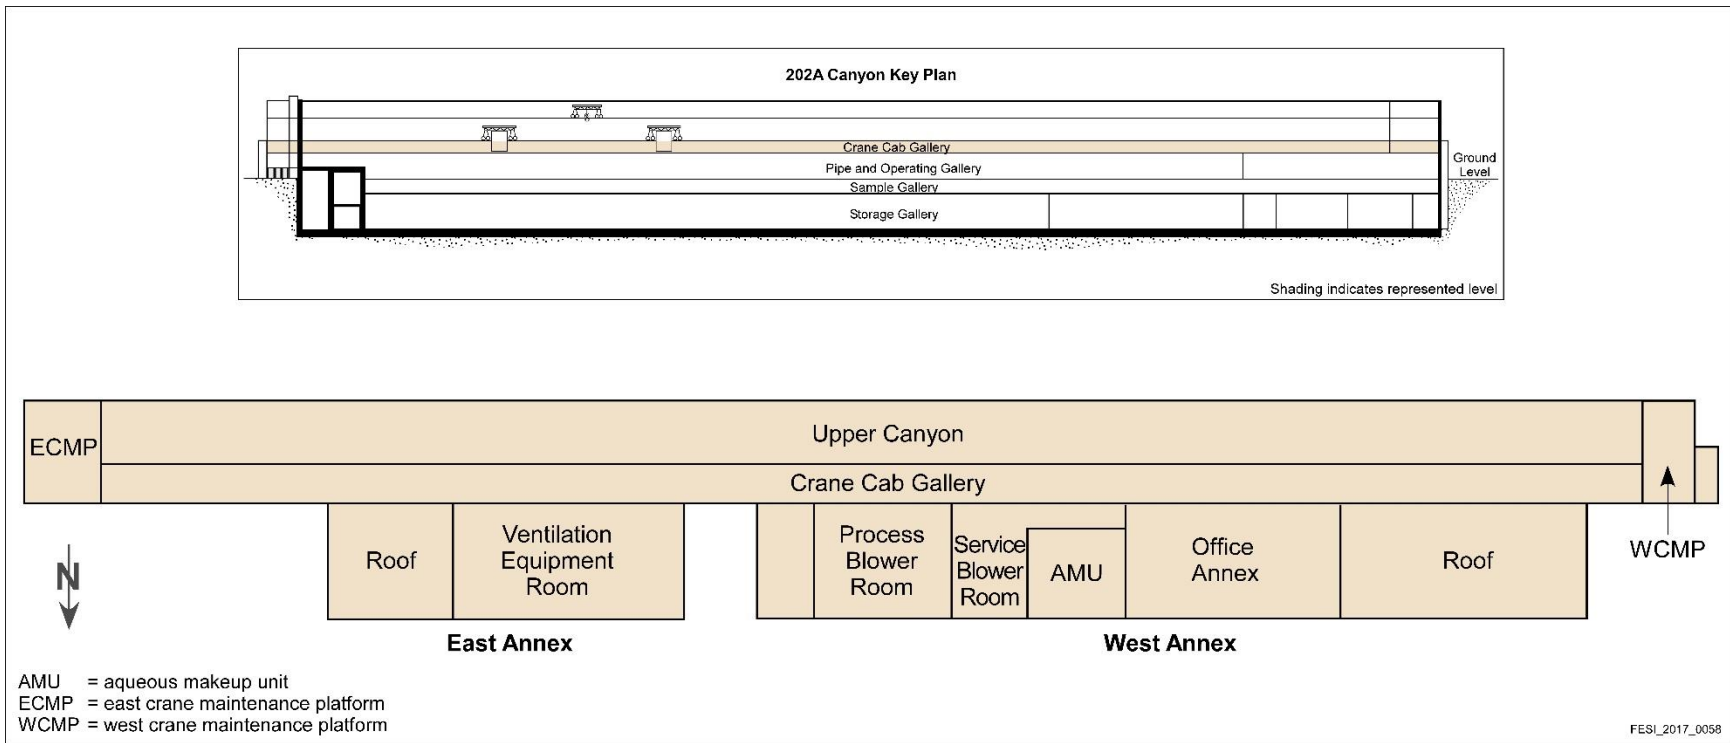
202A Building Crane Cab Gallery Level Plan View
